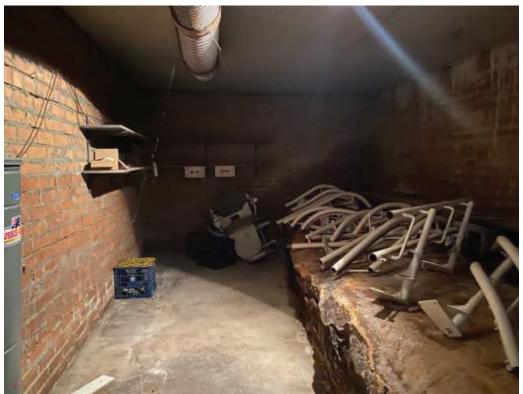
The 'existing sub-floor area' looking west. Source: CPS site inspection October 2022
